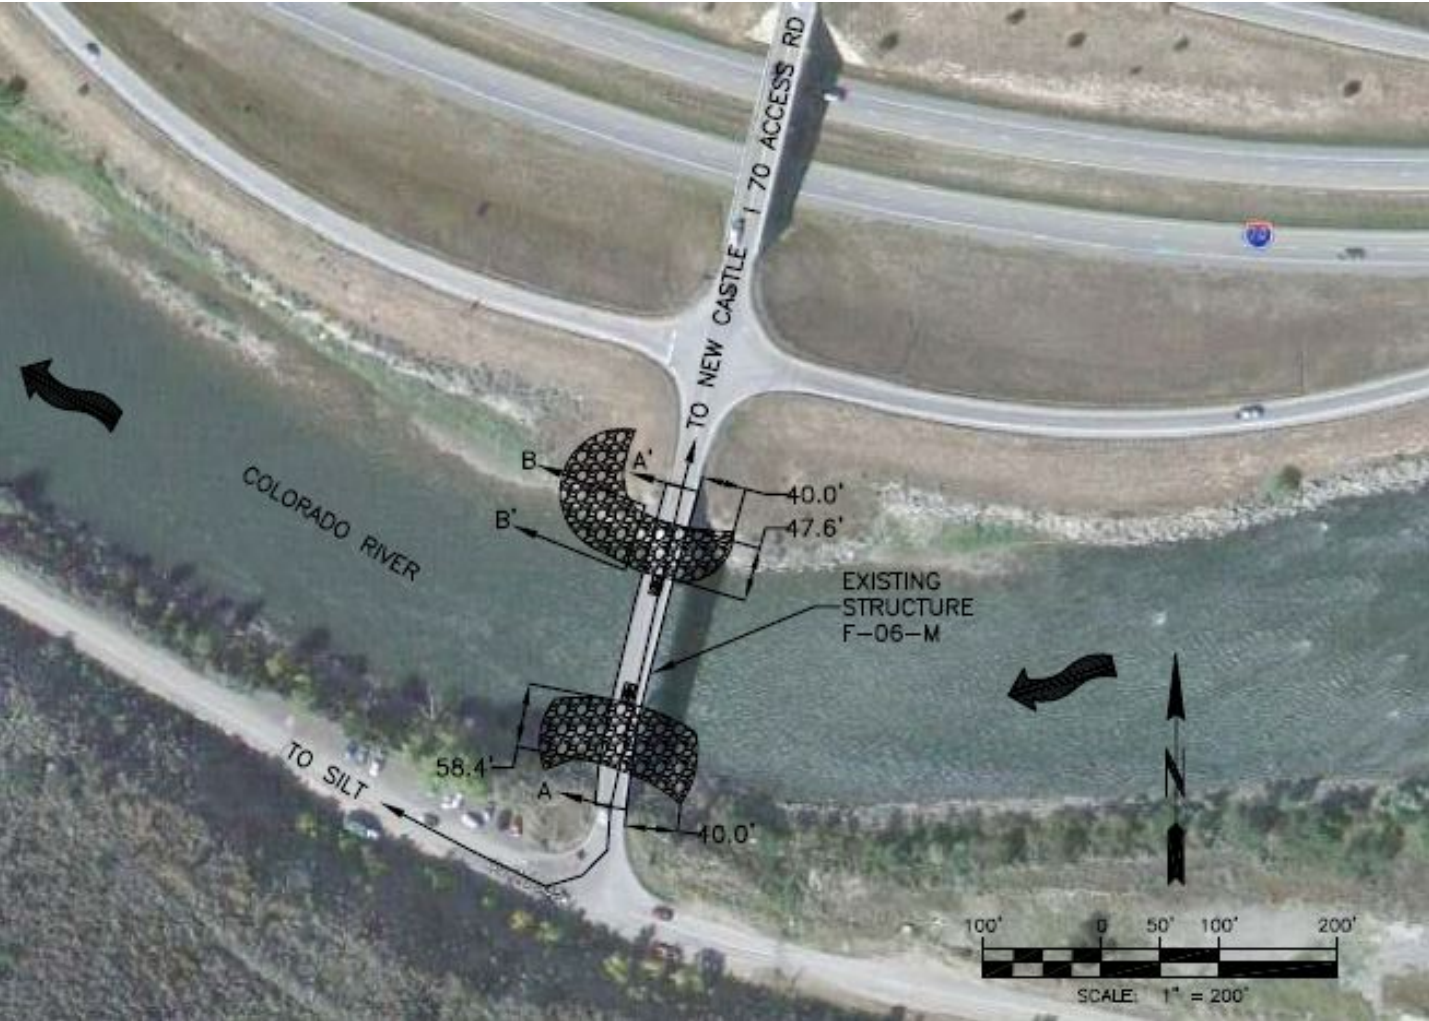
Plan view of Bridge F-06-M with recommended hydraulic scour countermeasure locations
